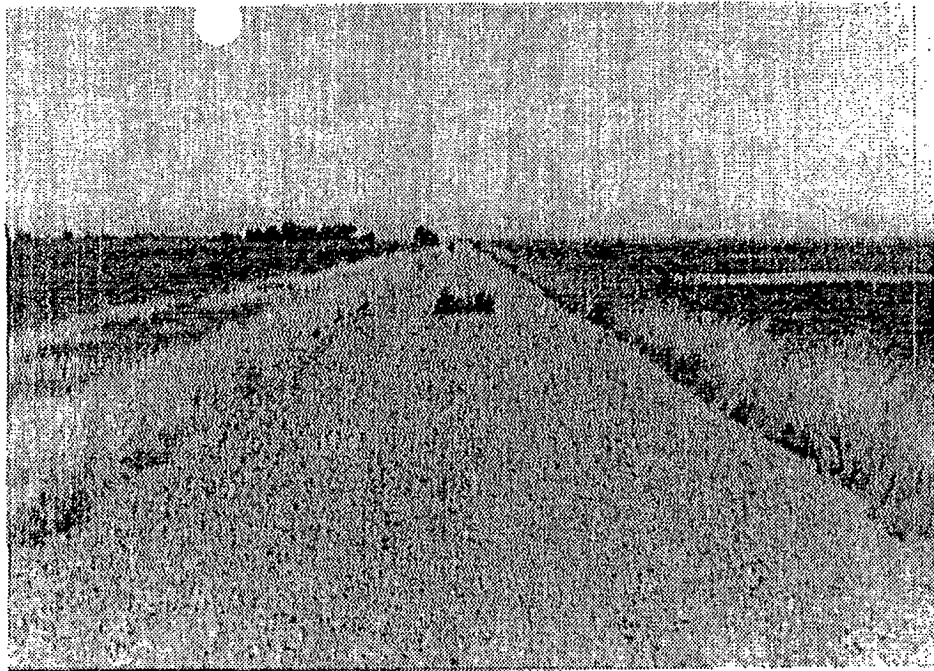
Site 20 - Cherokee Canal. Typical South bank levee .
